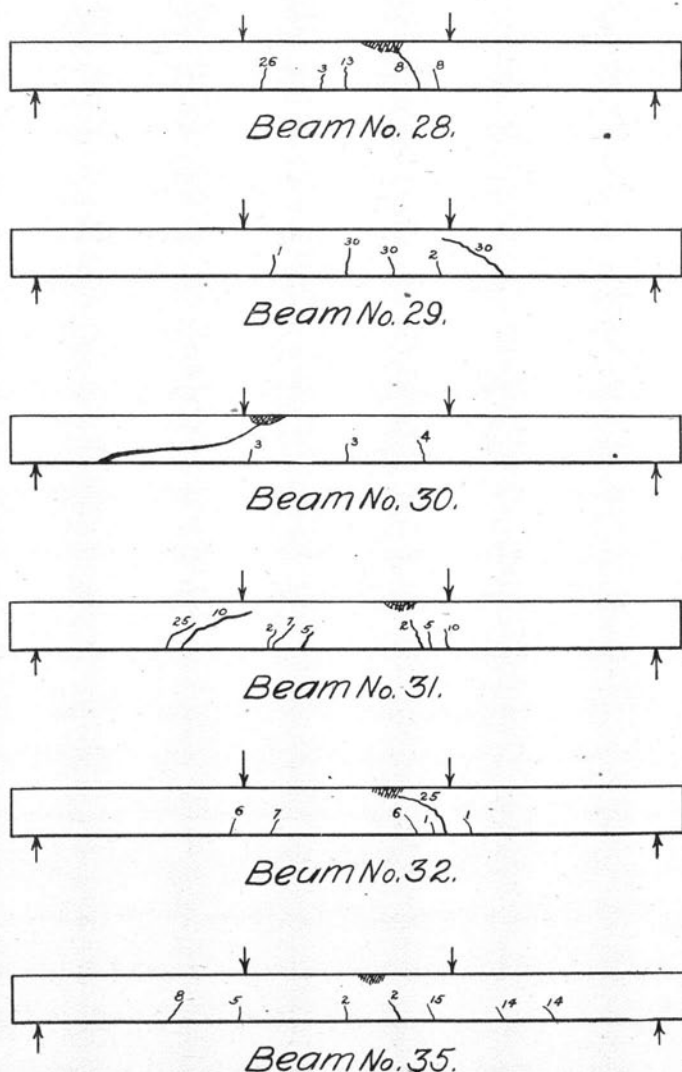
SKETCHES SHOWING BEAMS AFTER FAILURE UNDER REPETITIVE LOADING.
